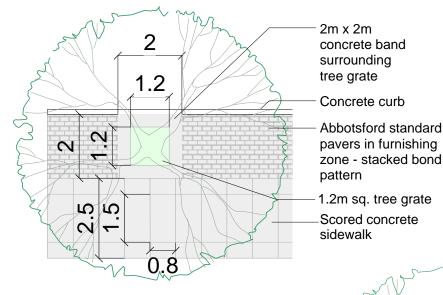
Tree Grate Detail - Ridgeway Avenue (South Side)
